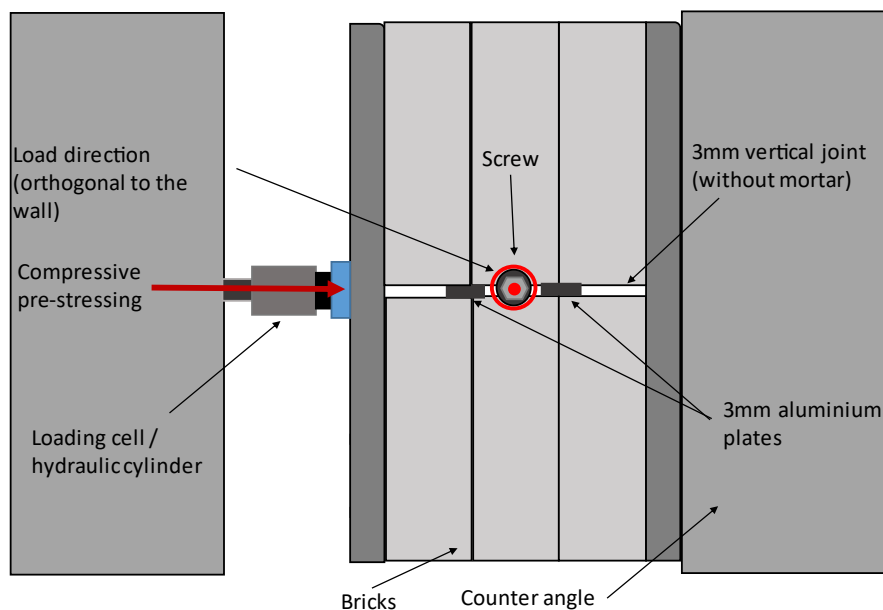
Schematic drawing of test setup for tension tests in vertical joints (test series A1j)
